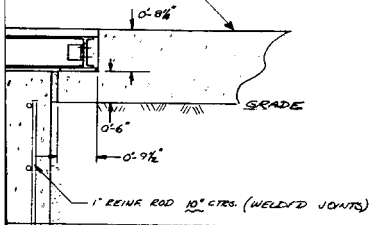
NASA/ERC Laboratory Pier - Pad Detail
